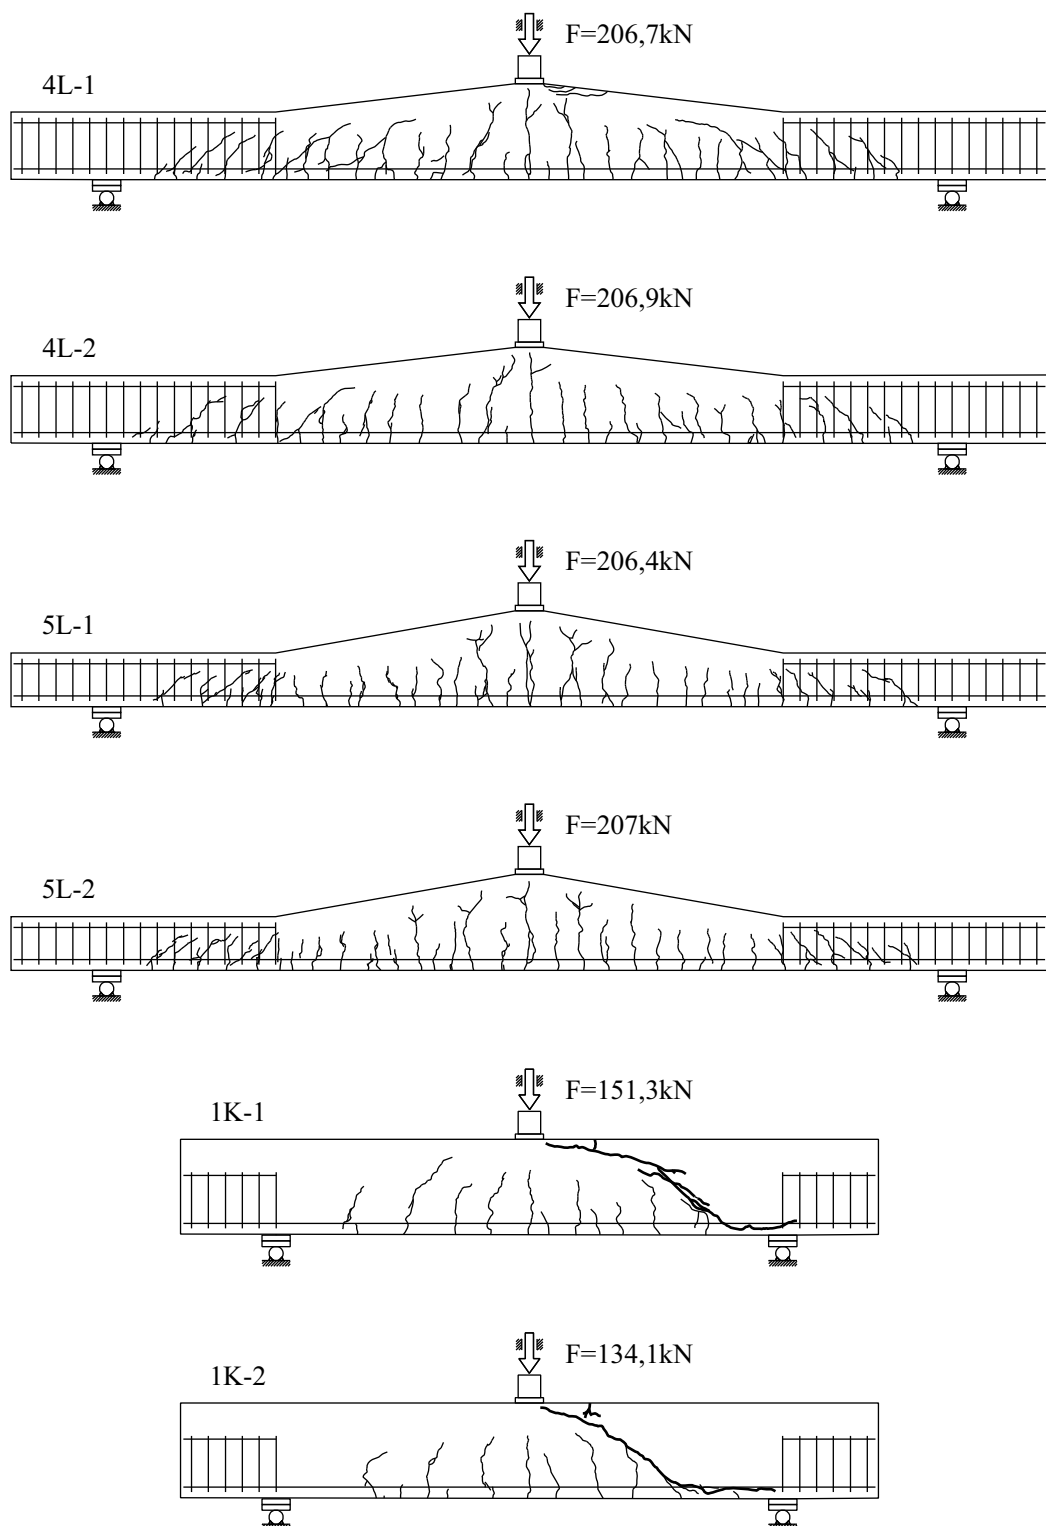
Crack pattern at failure of all test beams (cont.)
